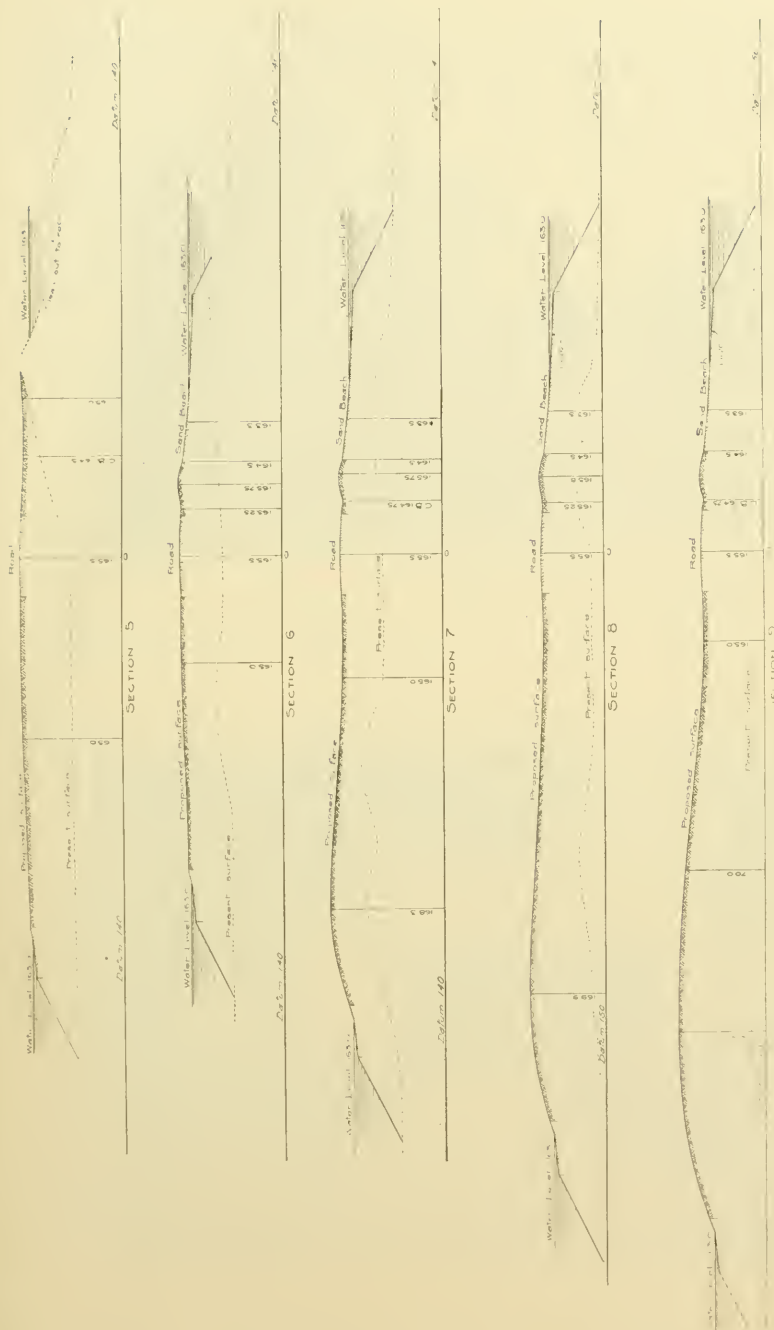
CROSS SECTIONS OF CAUSEWAY AT DARK HOLLOW POND.
